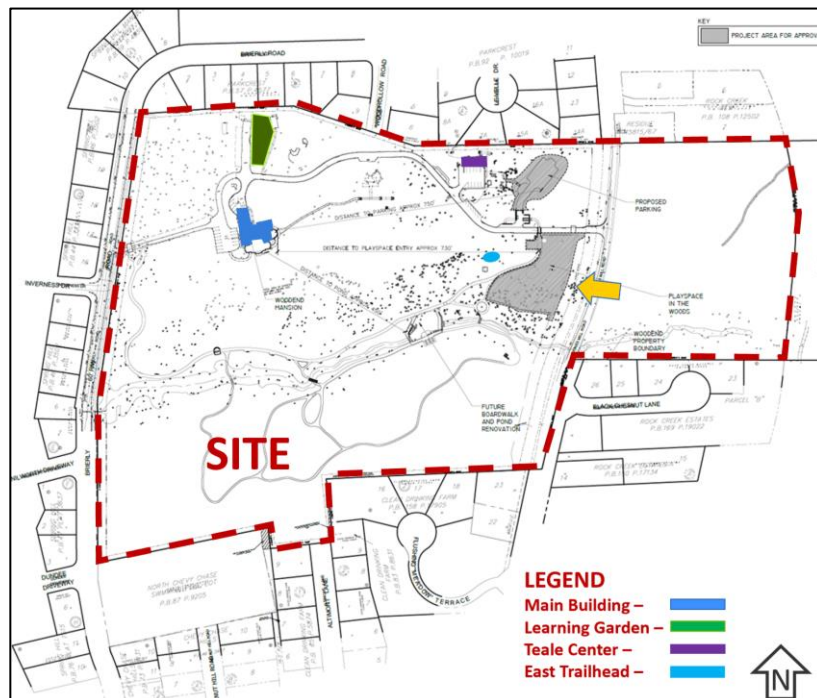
Parking and Drop-Off/Pick-Up Facilities
